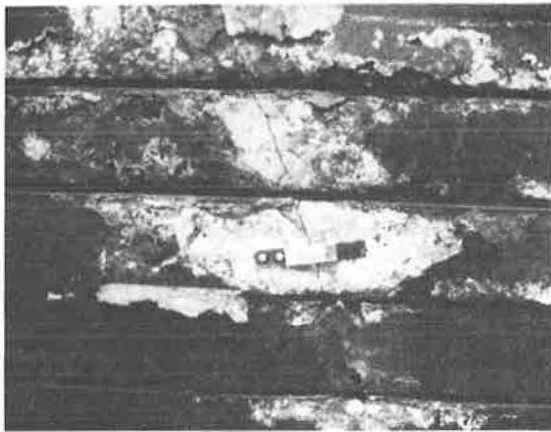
Corrosion of permanent-form decking underneath the concrete floor slab of a parking garage. Note the strain gage used to measure deflections across the crack (15).
